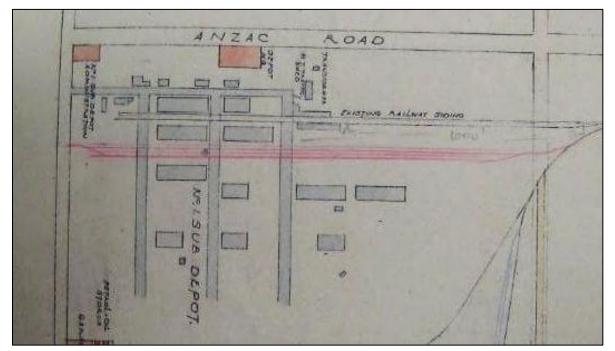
Detail of No. I Sub depot on corner of Anzac Rd and Moorebank Avenue 16/9/43 (Source: NAA: SP459/1, 420/7/1153)
